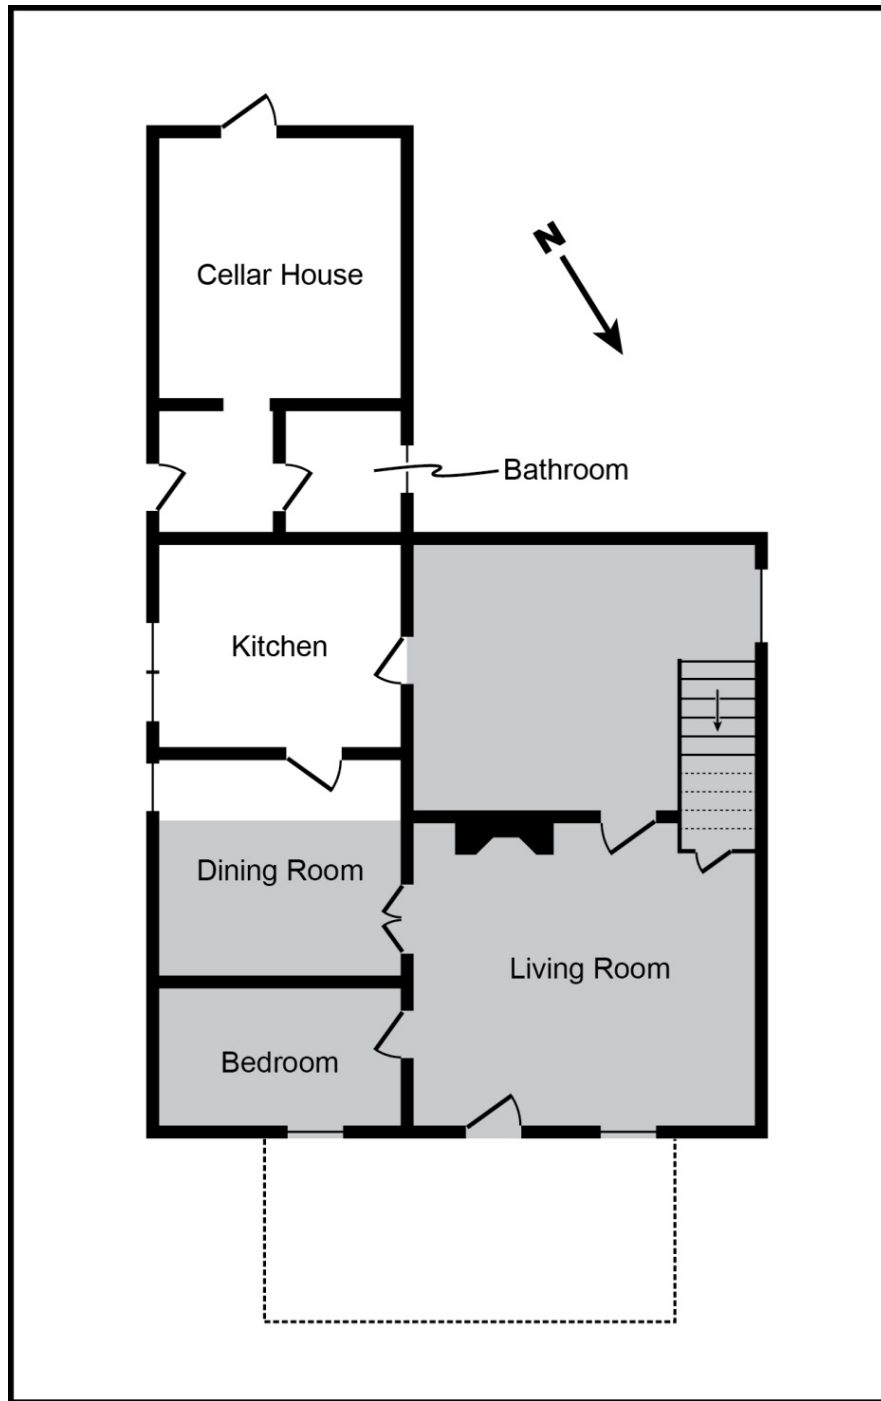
Plan of WA-0203- not to scale. Gray-shaded rooms appear to be first phase of construction.
